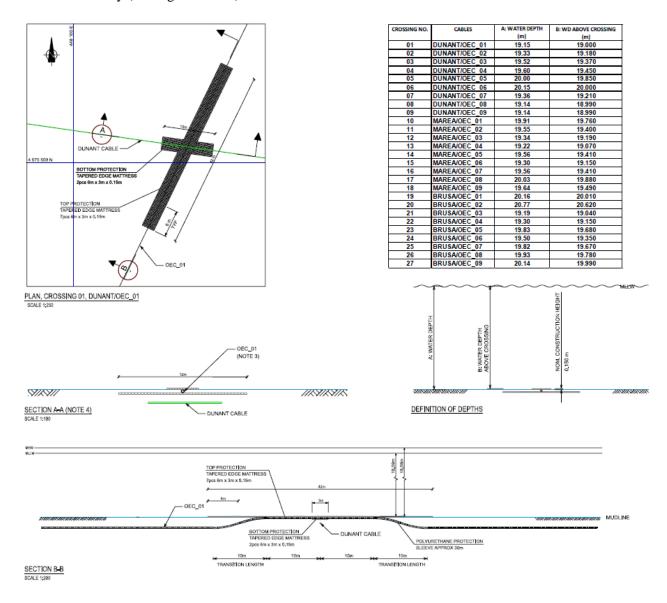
Example Schematic of Offshore Export Cable Crossing (Figure provided courtesy of Ramboll)
